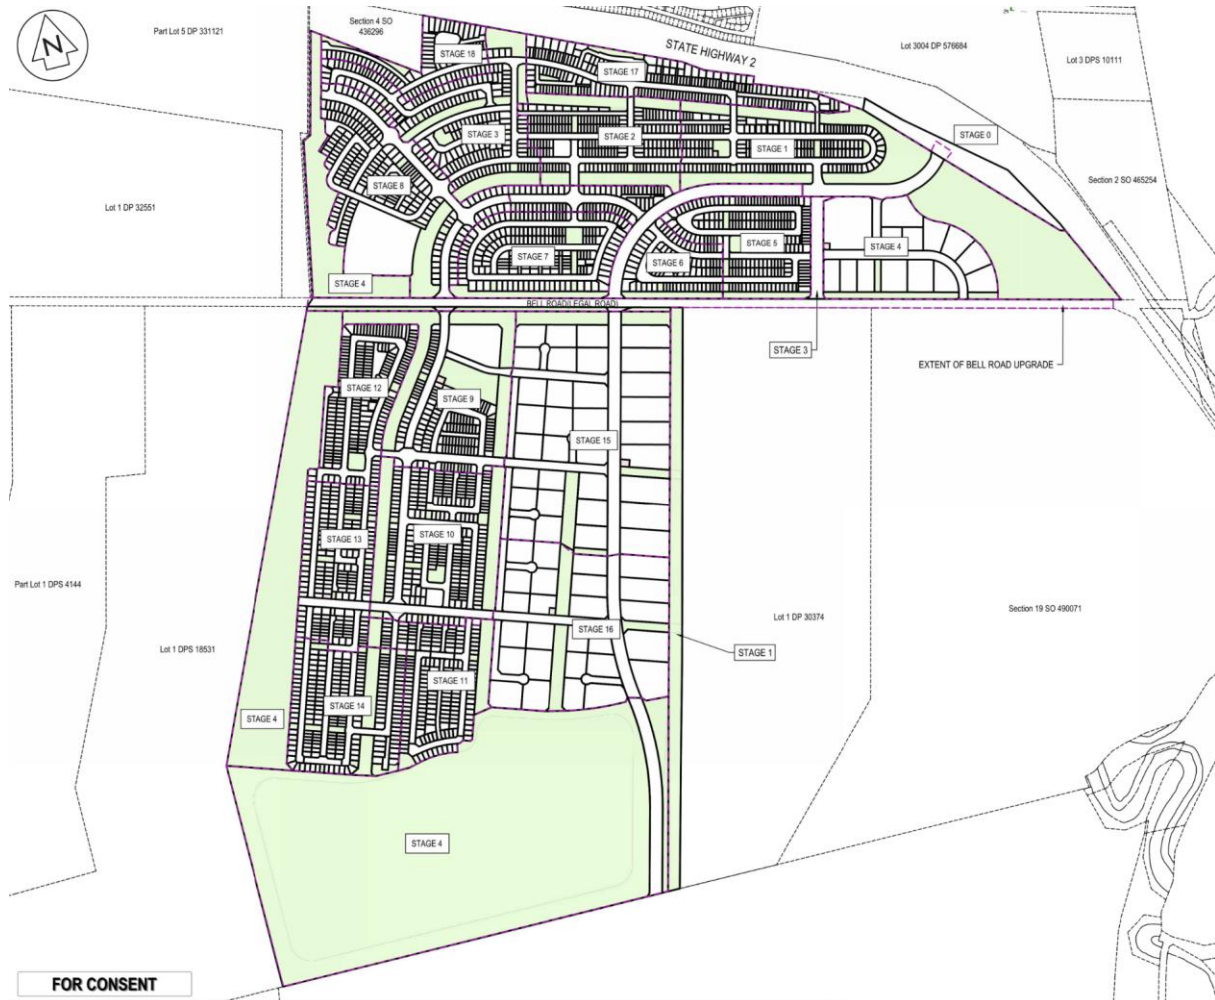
Wairakei South Scheme Plan (Maven Scheme Plans, Appendix M)
